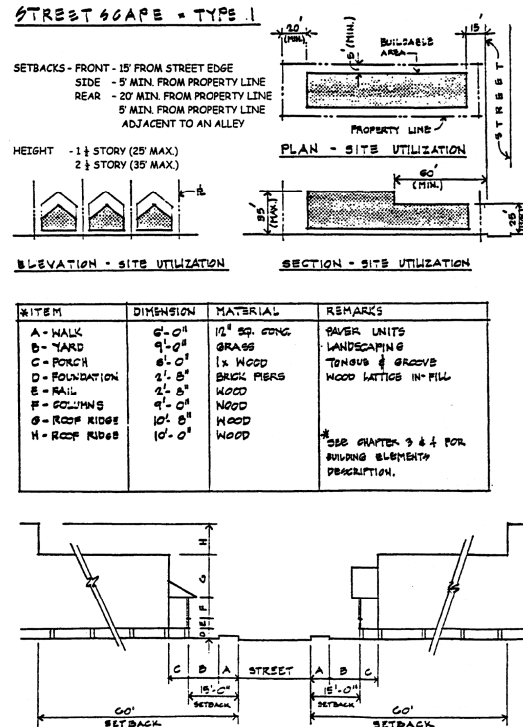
WOOD COTTAGES DISTRICT-STREETScape, TYPE 1
